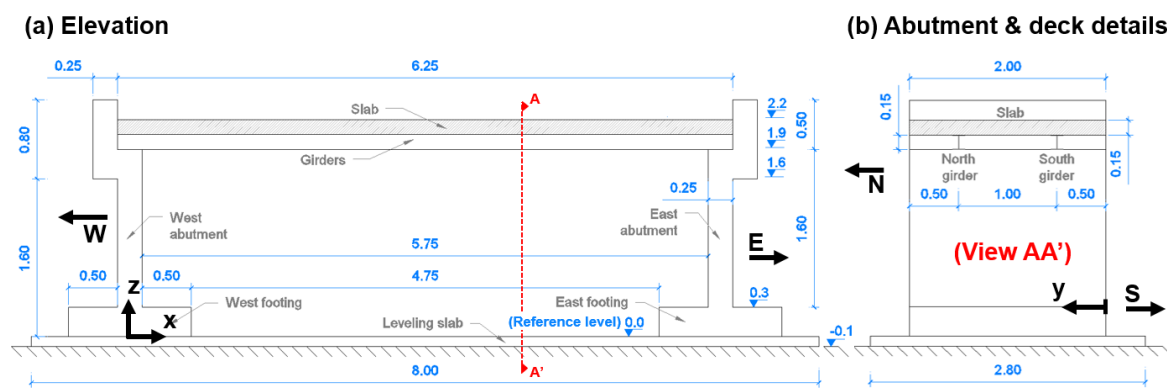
Bridge geometry in FDS6: (a) Elevation and (b) Abutment and deck details. All the dimensions expressed in m.
